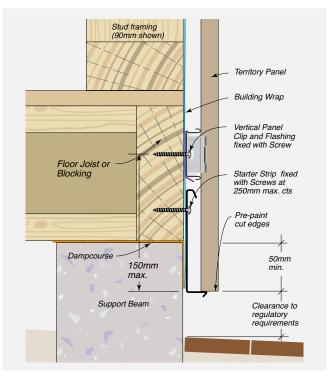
Second Storey Junction with Masonry, Brick Veneer or Hebel Panels – Cantilevered Framing
